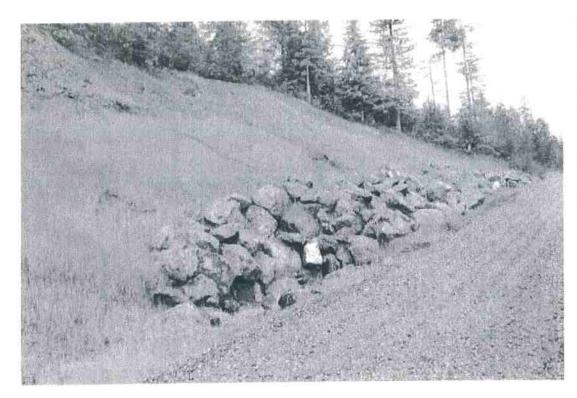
This wat and potentially unstable cut slope on a newly constructed road was stabilized naing a buttress of large rock armor. To assure their effectiveness, rock buttresses and other retaining structures should be designed by a qualified engineer or engineering geologist.
